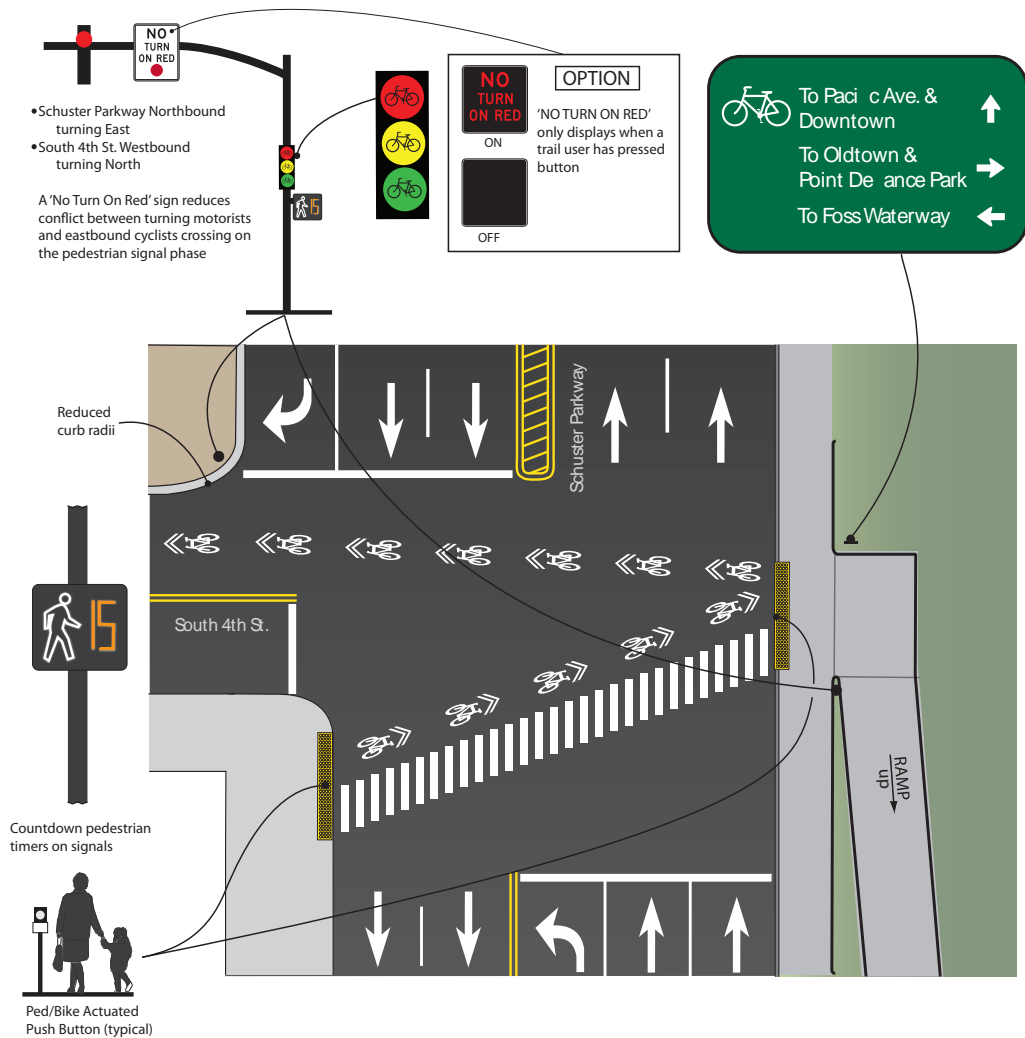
Schuster Parkway at South 4th Street - Intersection Improvements
